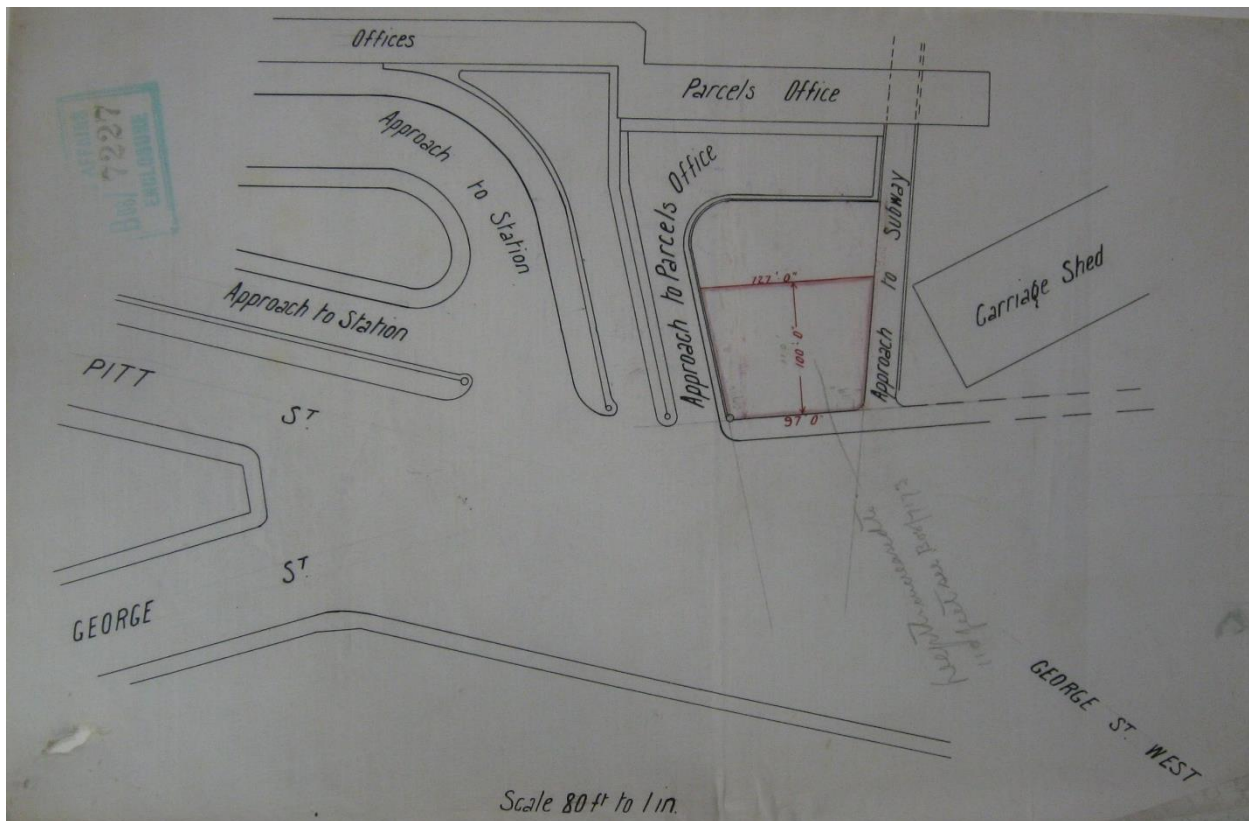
Block plan of proposed site of Parcels Post Office in proximity to Parcels Office at Central Square, Sydney, c1909.
